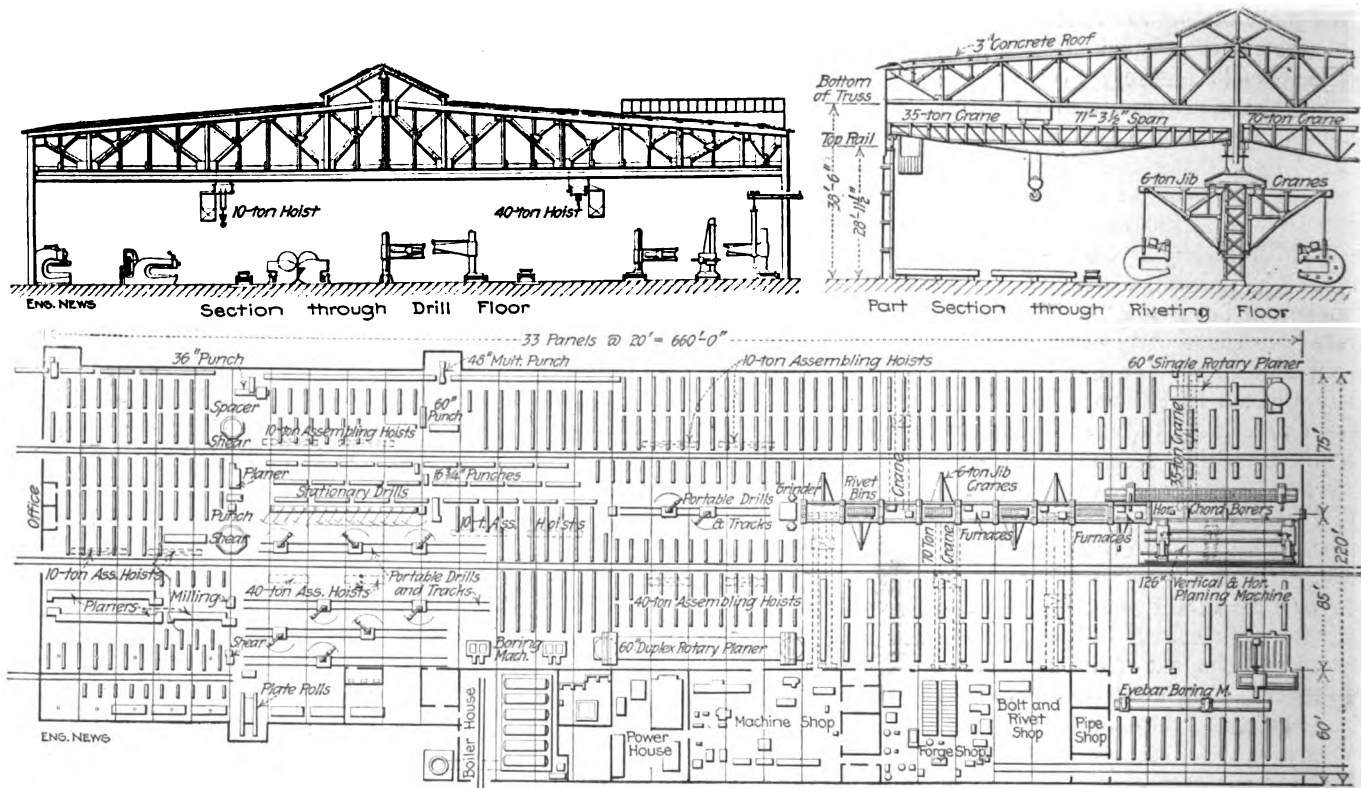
PLAN AND SECTIONS OF SHOP FOR FABRICATION OF QUEBEC BRIDGE
